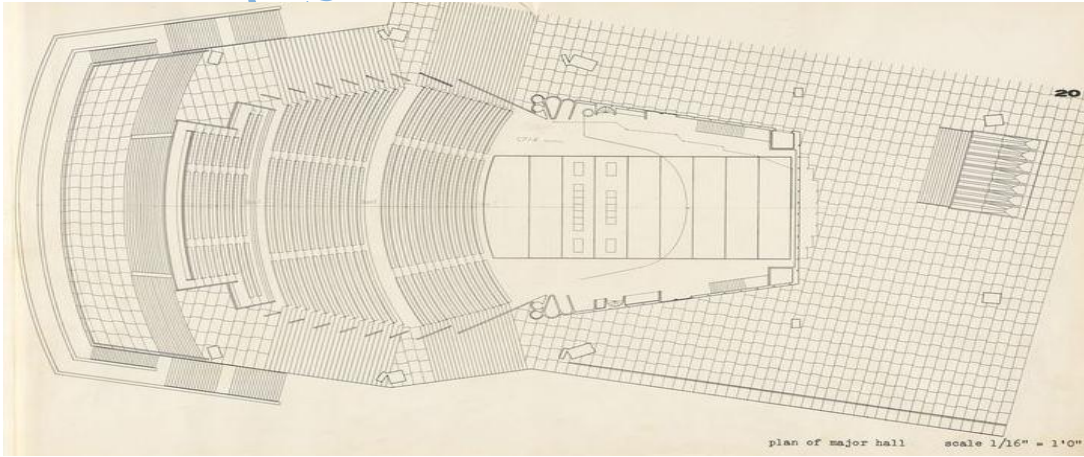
Plan of the Major Hall, Sydney Opera house Source:
